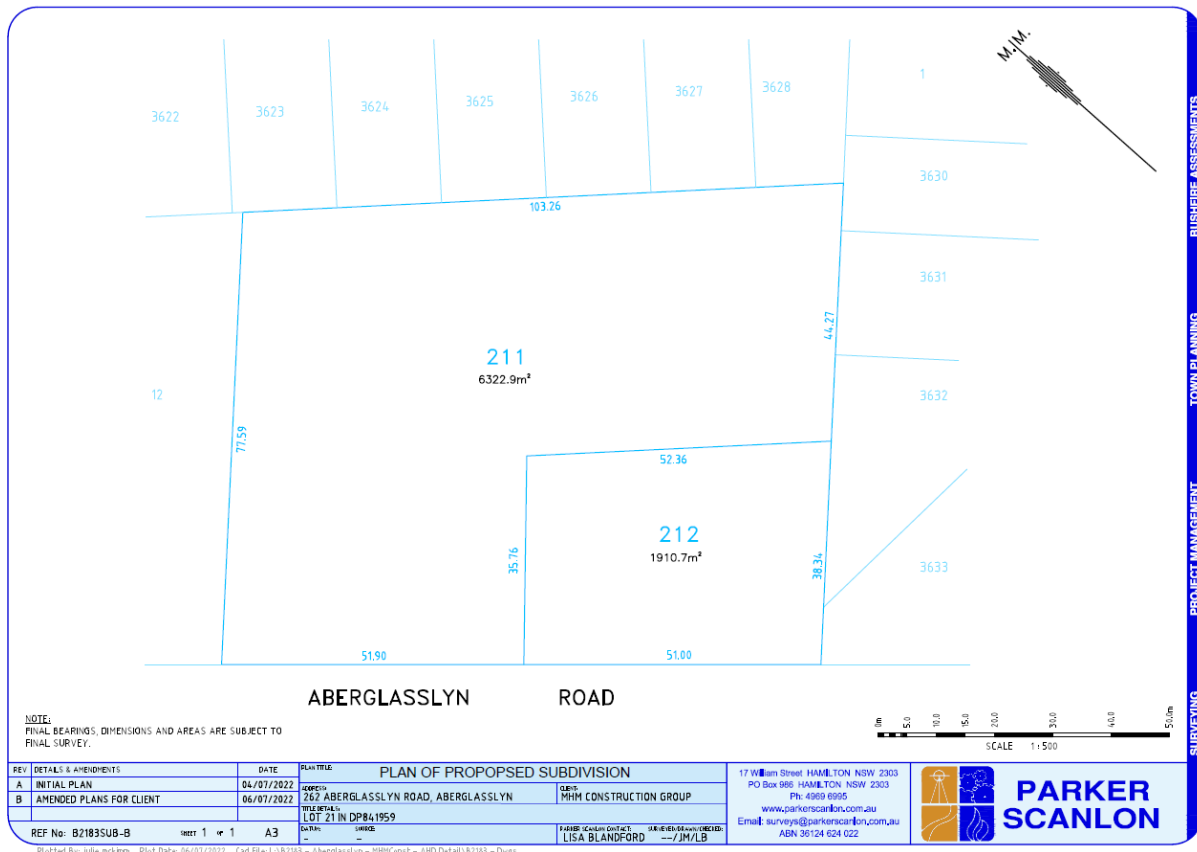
Proposed Residential Strata Subdivision Plans (Parker Scanlon)
